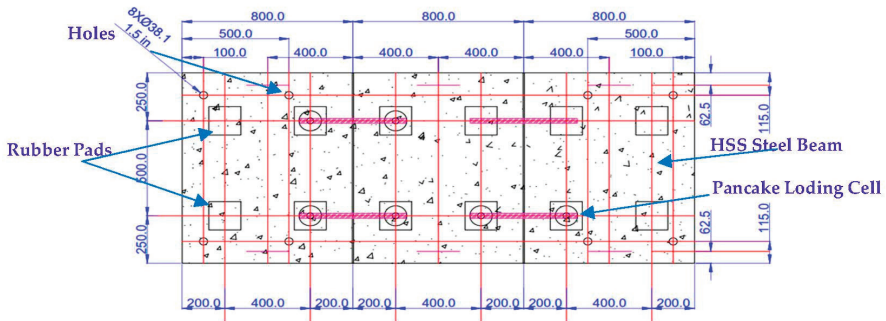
LTE Test Set-up Details of the Concrete Slab Specimen with Dimensions in mm.
